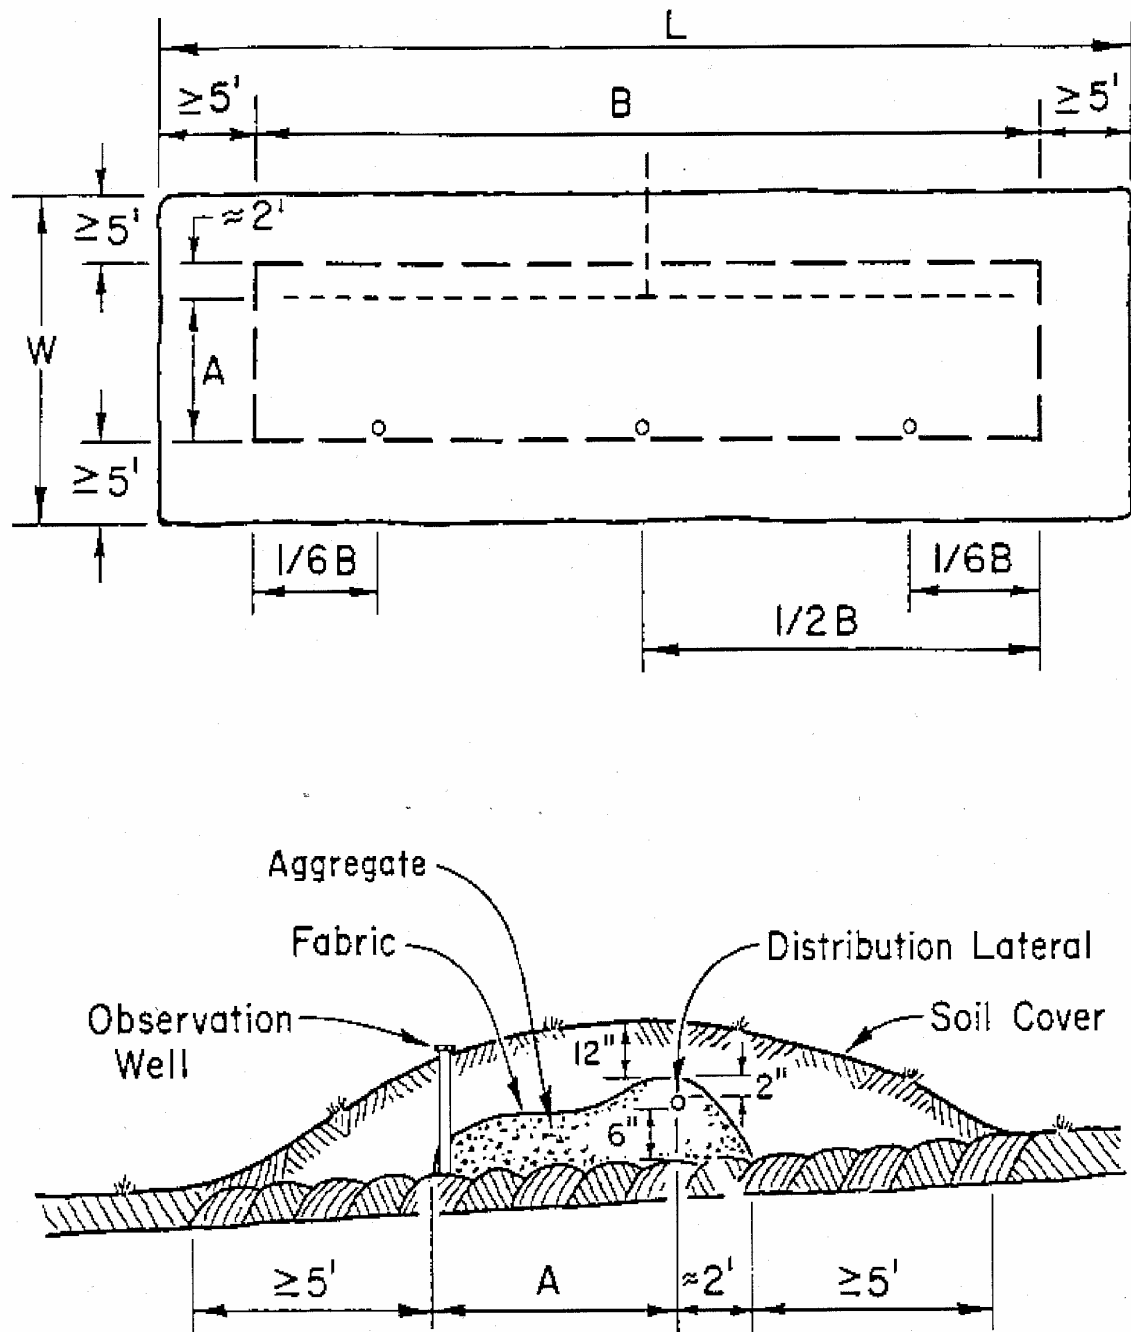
Cross section and plan view of an at-grade unit on a sloping site (Converse et al, 1990)
